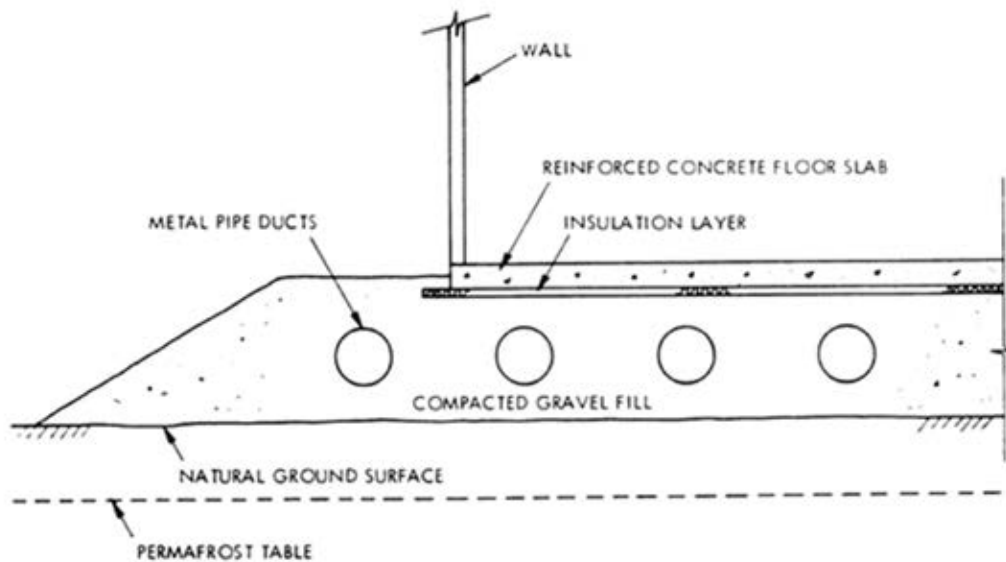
Shallow foundation on permafrost: typical insulated concrete floor slab placed on duct-ventilated compacted fill (after Johnston 1981)
